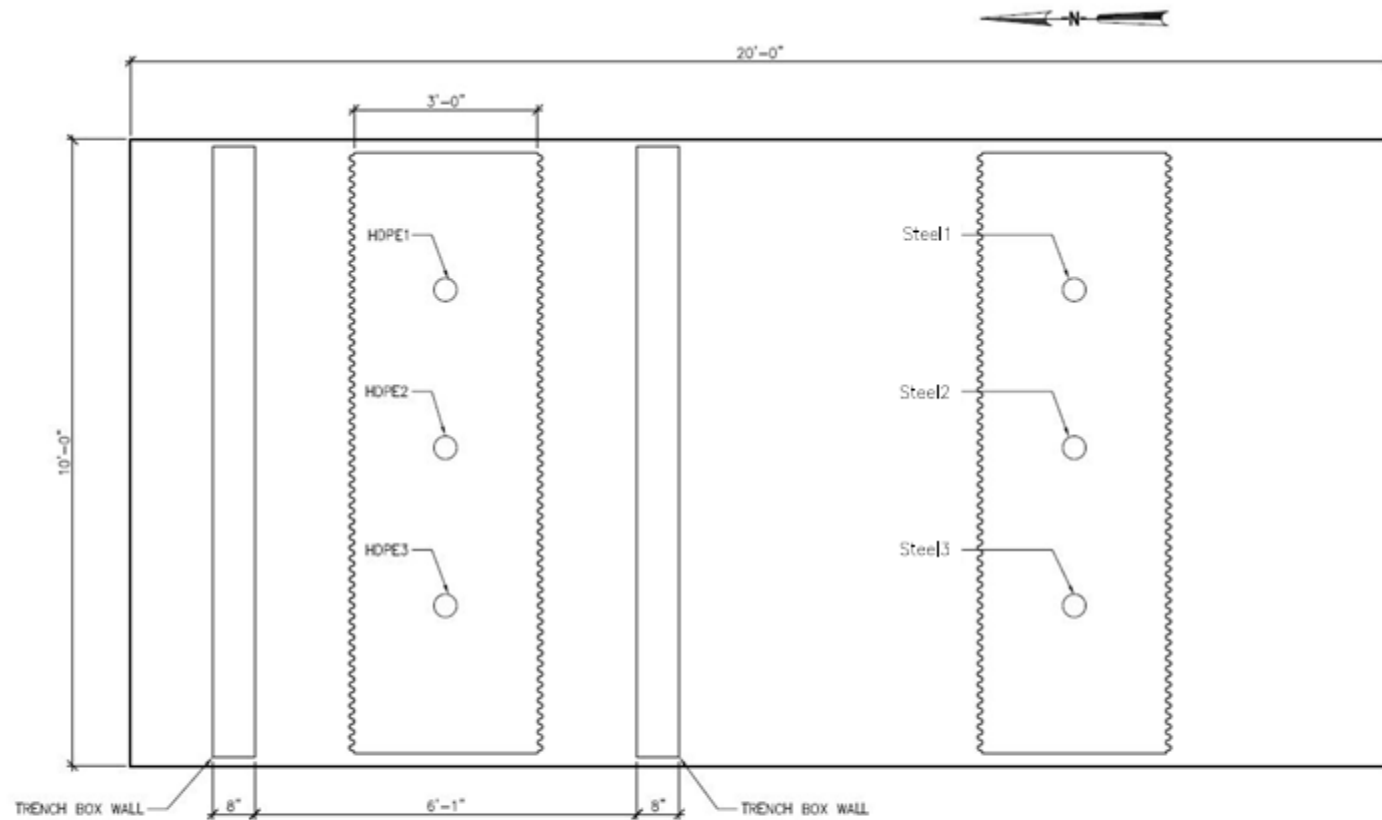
Earth pressure cell layout for trench box test one 6'-9" from bottom of Soil Box.
